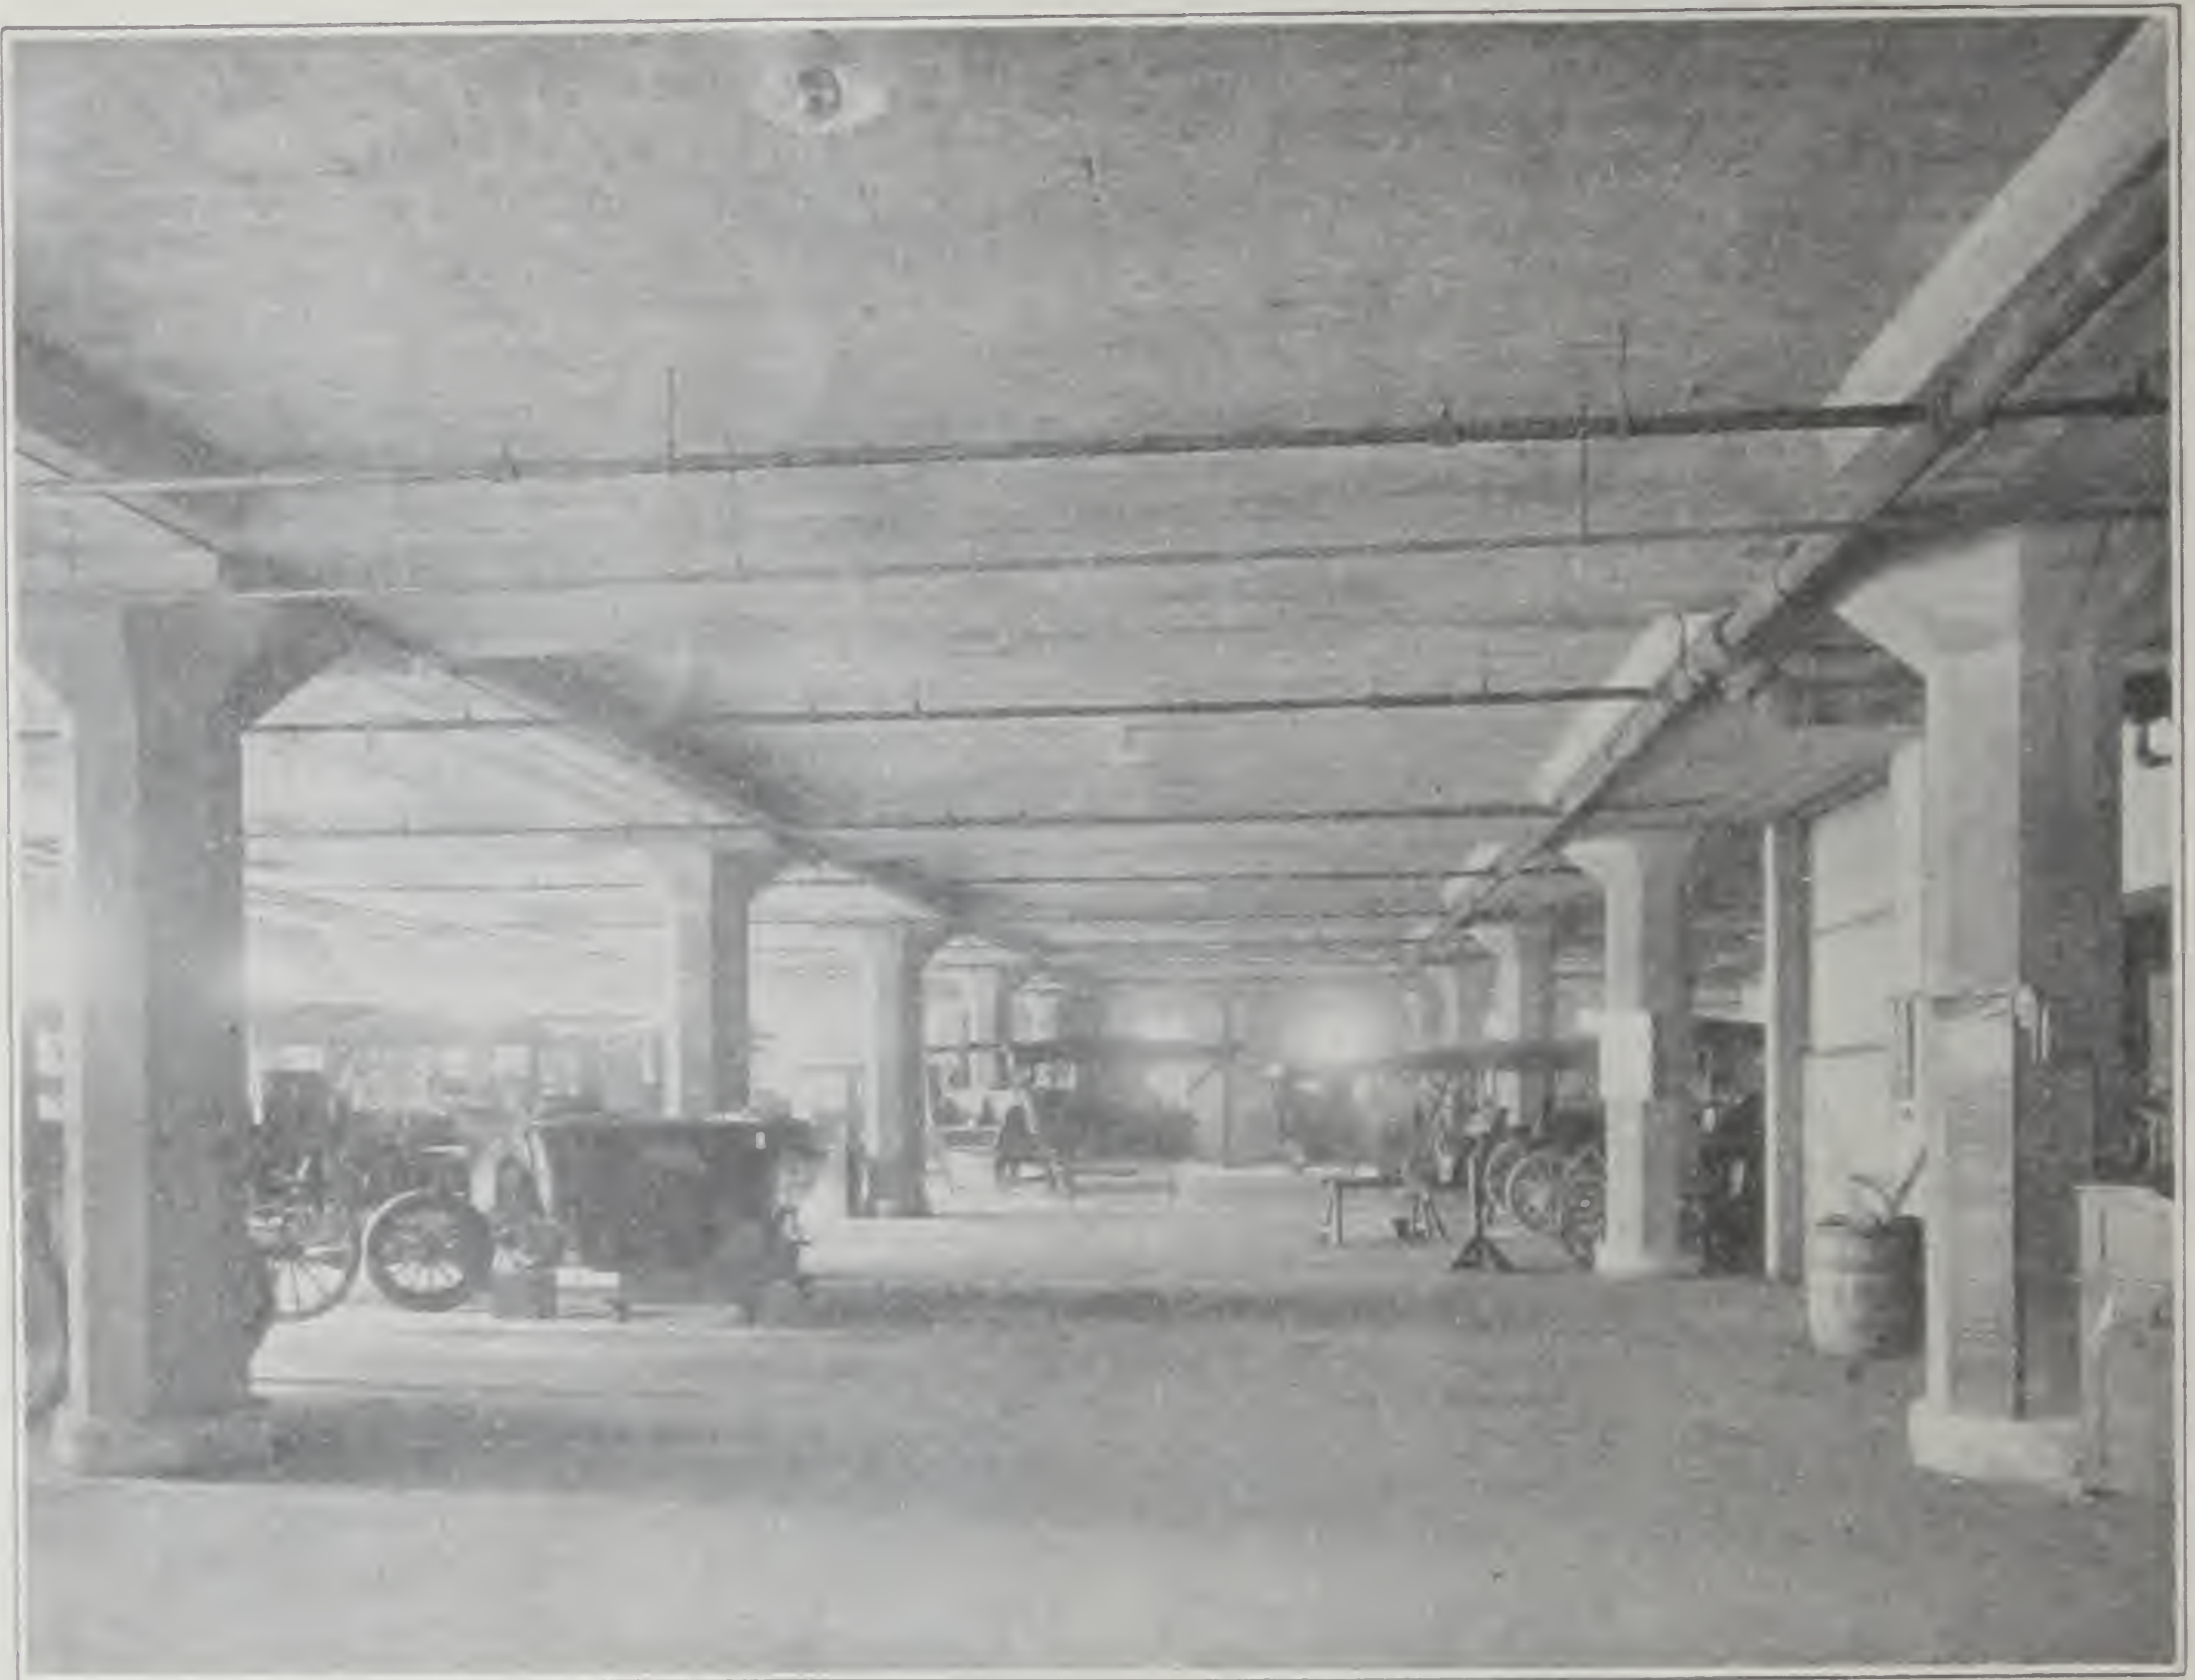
DEAD LOAD MAY BE REDUCED BY USING THE MODIFIED FLAT SLAB USING A THINNER CENTER SECTION.
